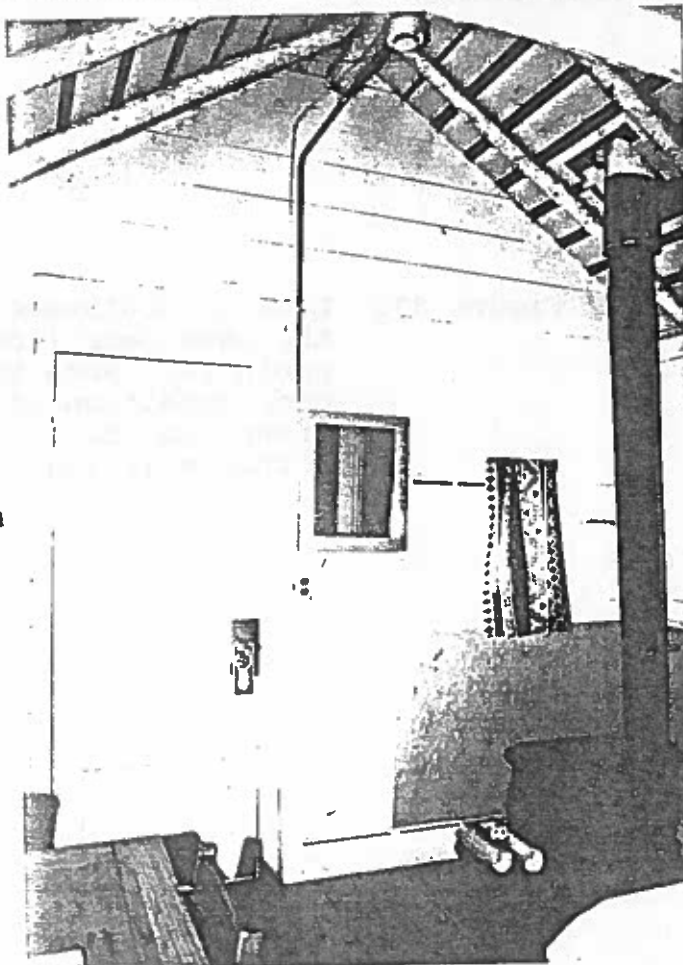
Looking southeast at the interior of cabin 16. Note the electrical conduit run down the walls.
